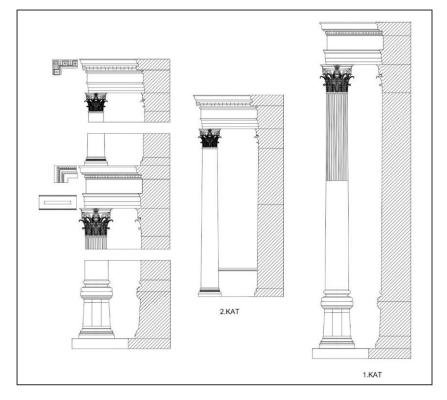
Colonnaded Galleries 1st and 2nd Floor Drawings (draw by D. Bayrak 2021)
